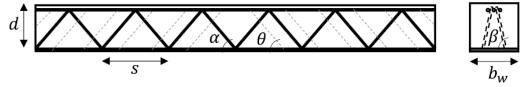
Beam truss model for shear strength calculation
